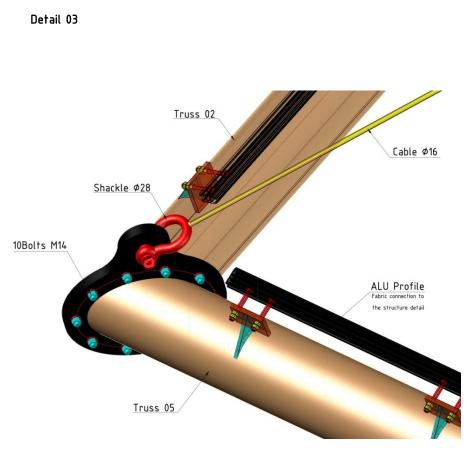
The above image shows the detail in 3 other corners of structure, Truss 02 and 05 connect to each other with flange.
